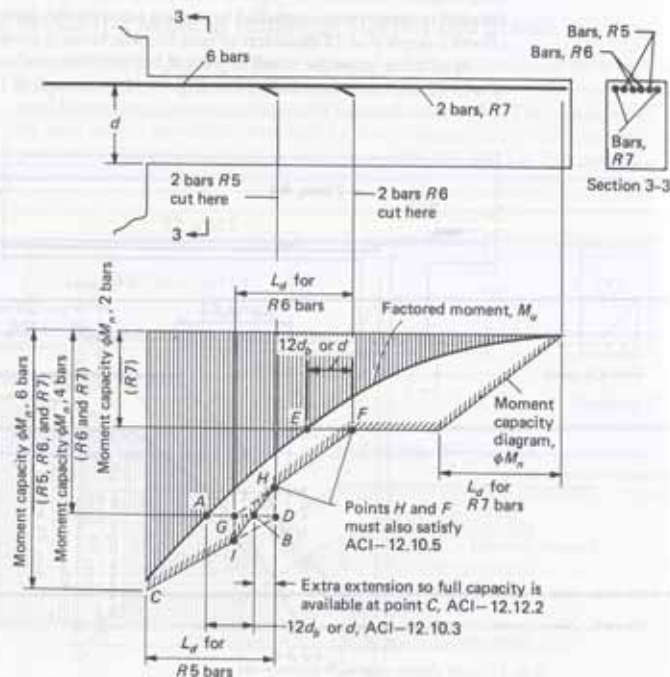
Bar cutoff in a uniformly loaded cantilever beam.
